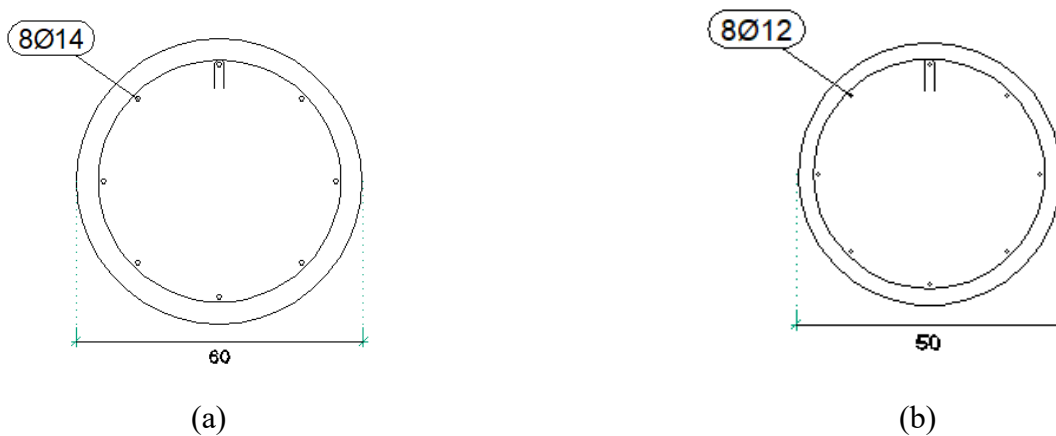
(a) Typical cut section of the column with 60 cm diameter ;(b) Typical cut section of the column with 50 cm diameter
